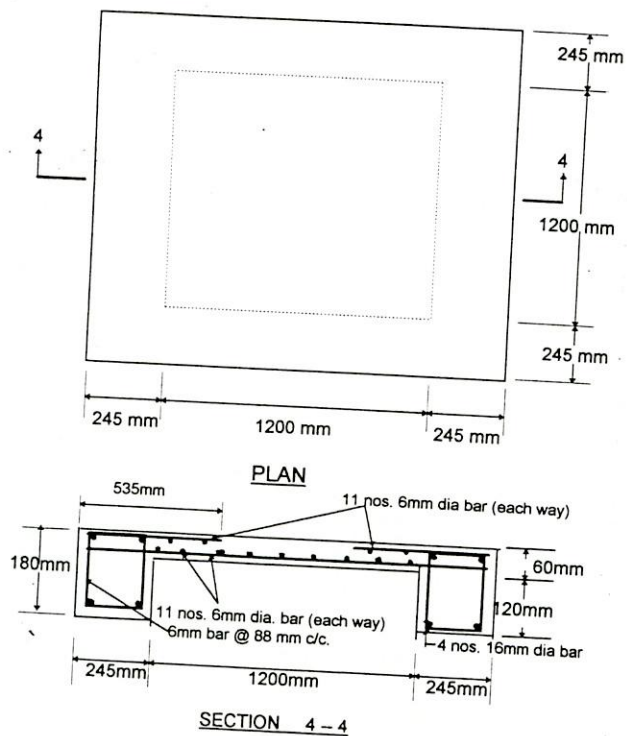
(a) Plan (b) Section and reinforcement details of SLAB4
